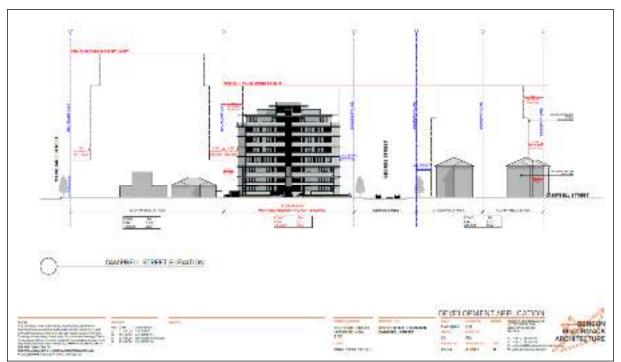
View of the Campbell Street Elevation of the Proposal (source: A-0011-D prepared by Benson McCormack Architecture).
